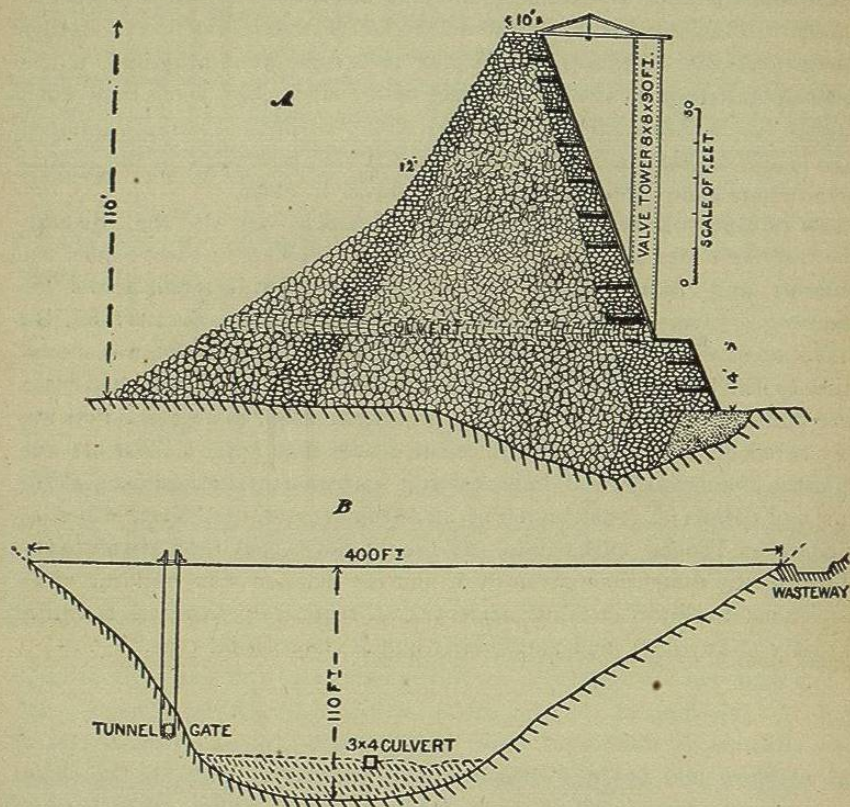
CROSS-SECTION AND ELEVATION OF WALNUT GROVE DAM, ARIZONA.
